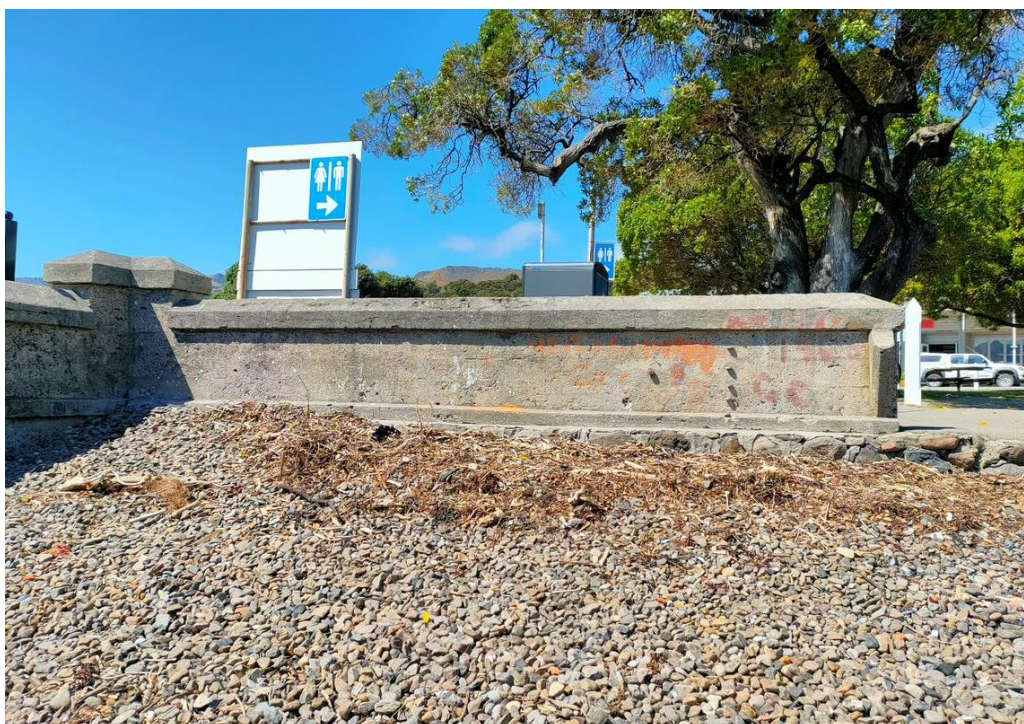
View of protective concrete wall running a short distance along the foreshore. It appears to be constructed atop a buried portion of the Akaroa Sea Wall. The image is taken looking east. Source: SIA 2021.
